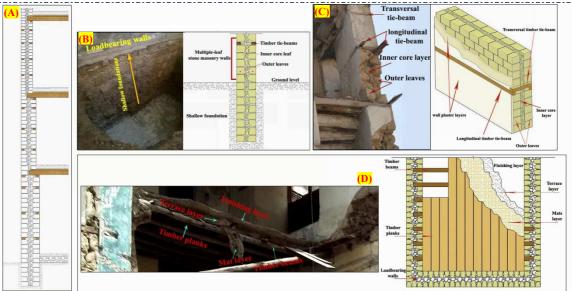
Construction details of Jeddah heritage buildings; (A) Sketch drawing of the external wall crosssectional view shows that the wall thickness reduced at each floor level, (B) Photo and cross-sectional view of the wall foundation, (C) Photo and 3D-model of stone masonry loadbearing walls and their components, (D) Photo and plan view of the predominant traditional roof.
